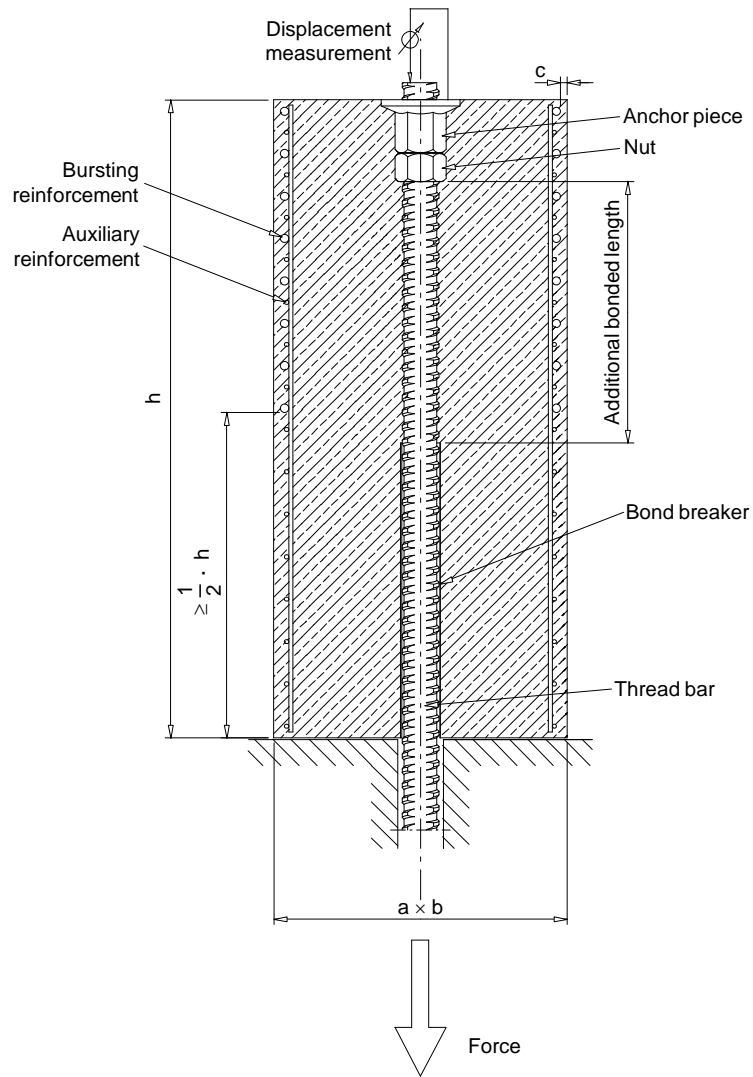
Torqued anchorage with torqued anchor piece – Load transfer test – Schematic examples
